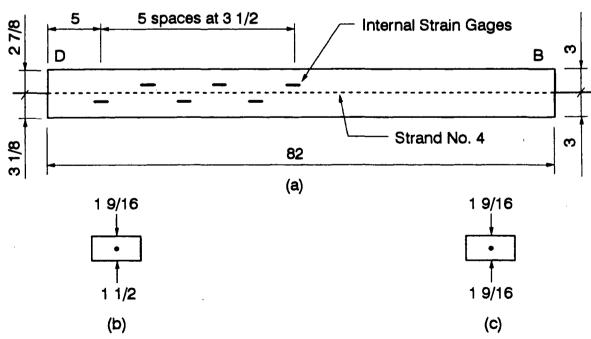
Specimen No. 17-3.0TC-8 (dimensions shown in inches):
